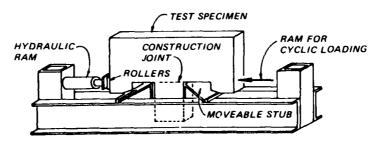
Test setup used by Paulay (after Paulay, Park, and Phillips 1974)
